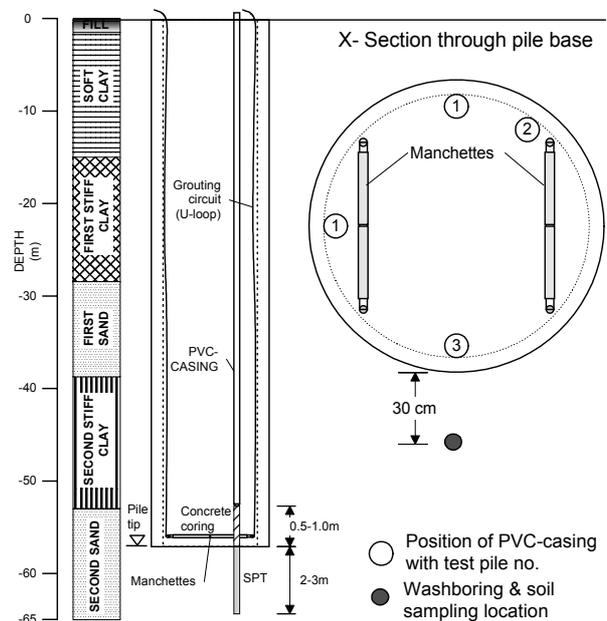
Schematic diagram of the positions of PVC casings in test piles with typical soil profile at the site.
